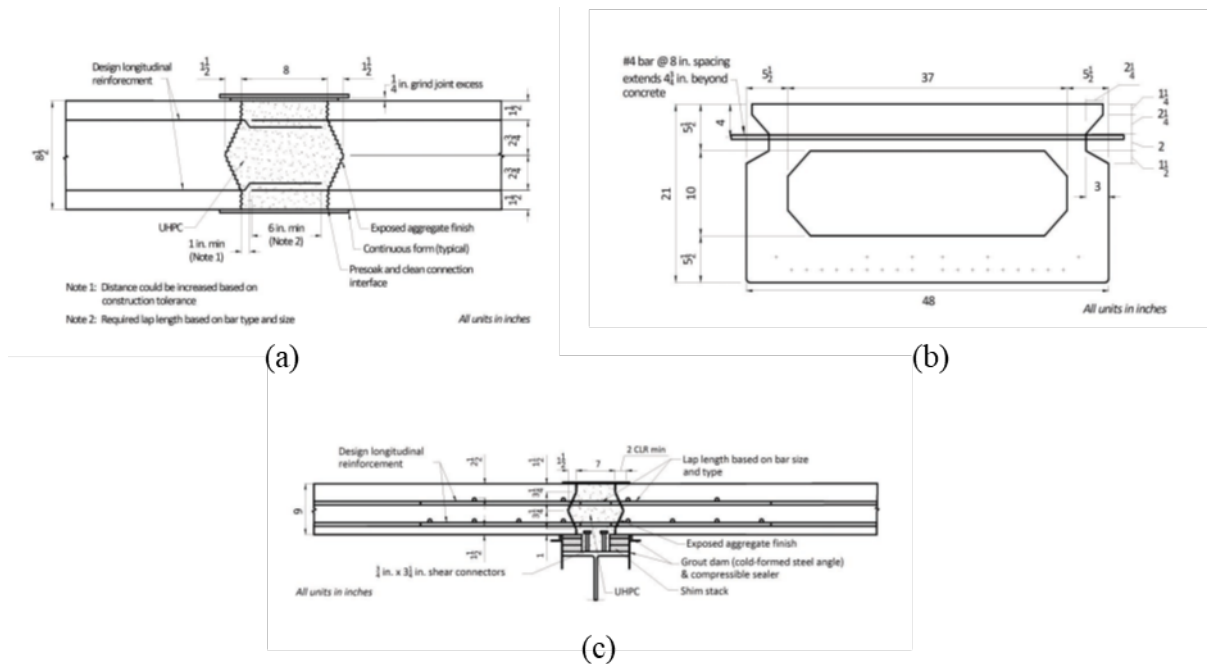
(a) UHPC connection between precast deck panels as deployed by NYSDOT on CR-47 over Trout Brook, (b) UHPC adjacent box beam connection detail, and (c) combined UHPC deck-level and composite connections as deployed by NYSDOT on I-81 near Syracuse, NY [22]
